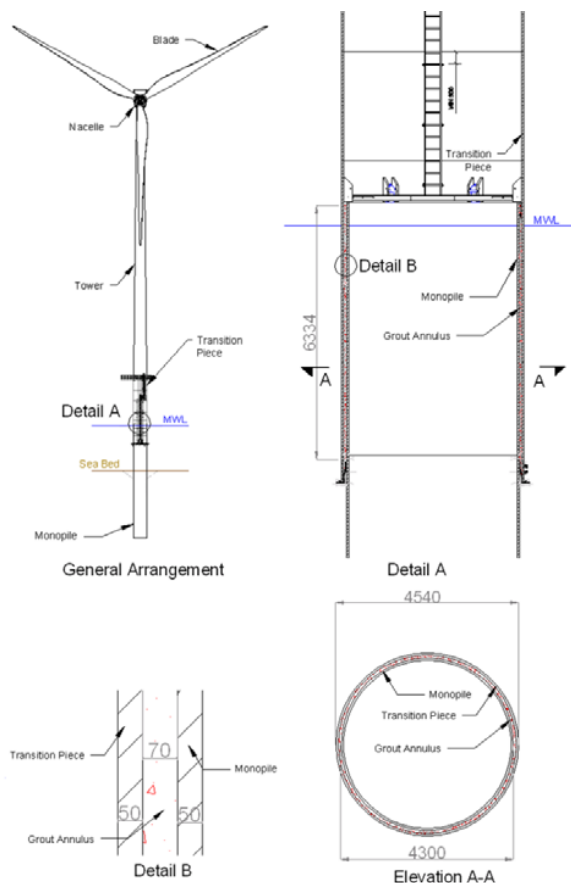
Typical general arrangement of WTG monopile grouted connection substructure
